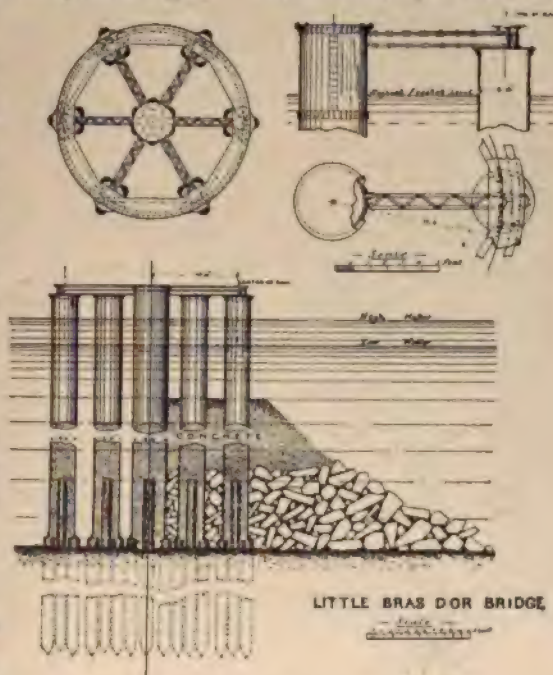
GROUP OF CYLINDERS FOR PIVOT PIERS.
